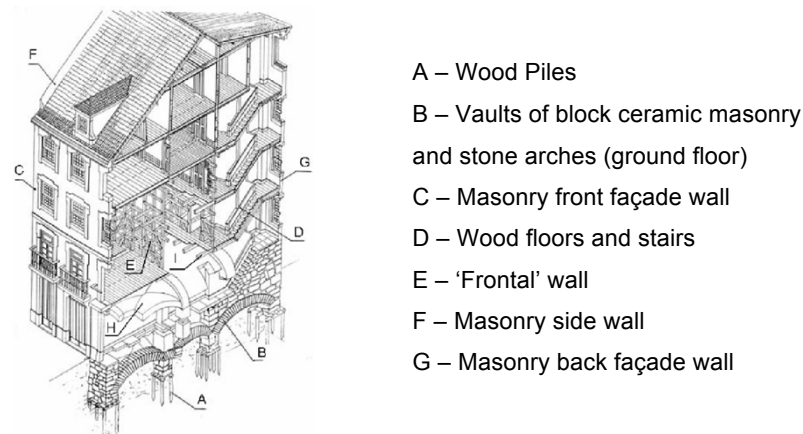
Structural details of a 'pombalino' building (adapted from Mascarenhas, 1996).
